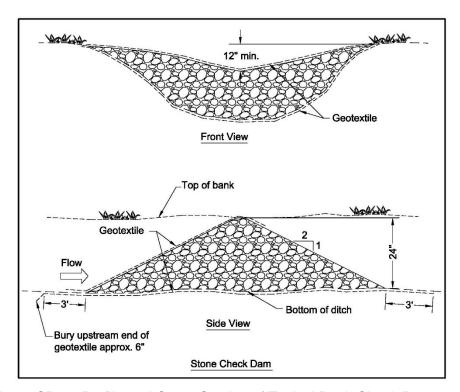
Profile and Cross-Section of Typical Rock Check Dams
